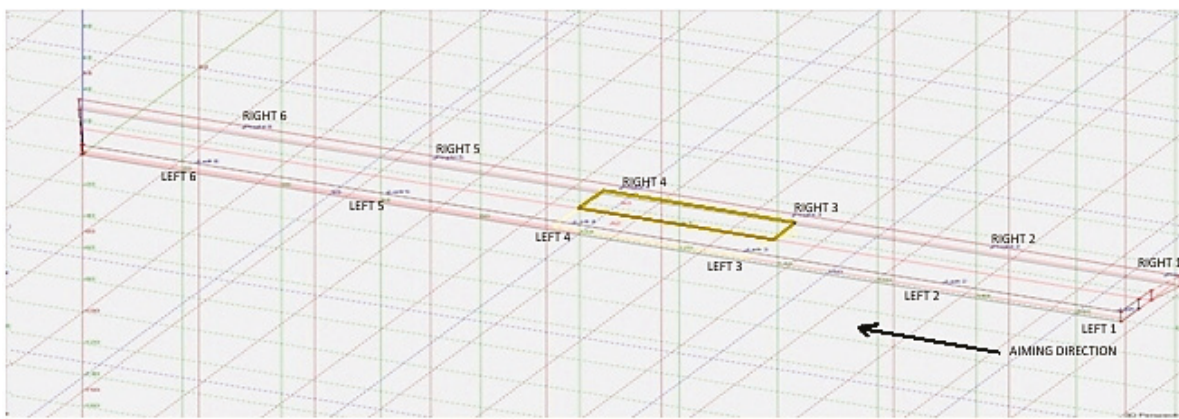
Iso view of the tunnel shows loudspeaker layout and the detailed test area (rectangular box)
